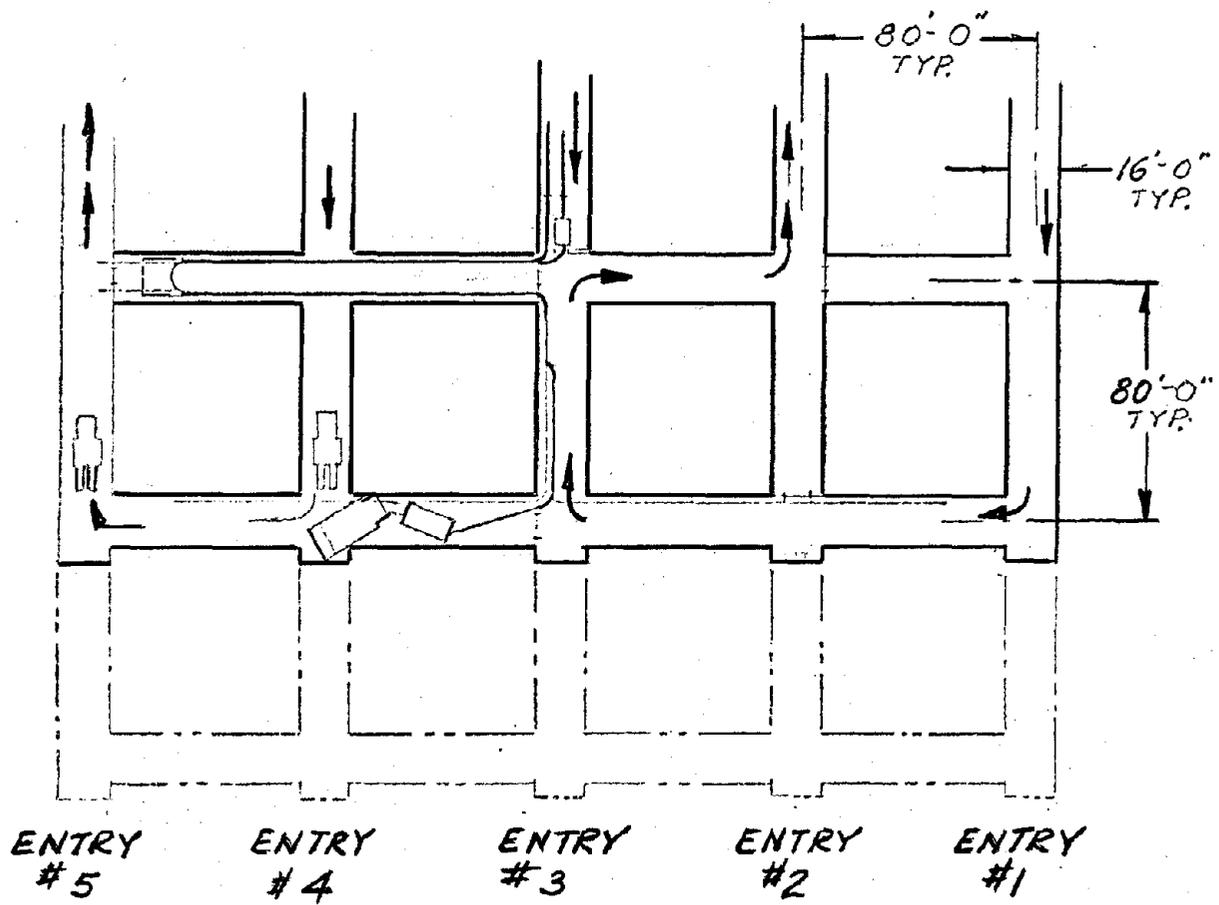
Mine Plan; First Cut in Entry No. 4
